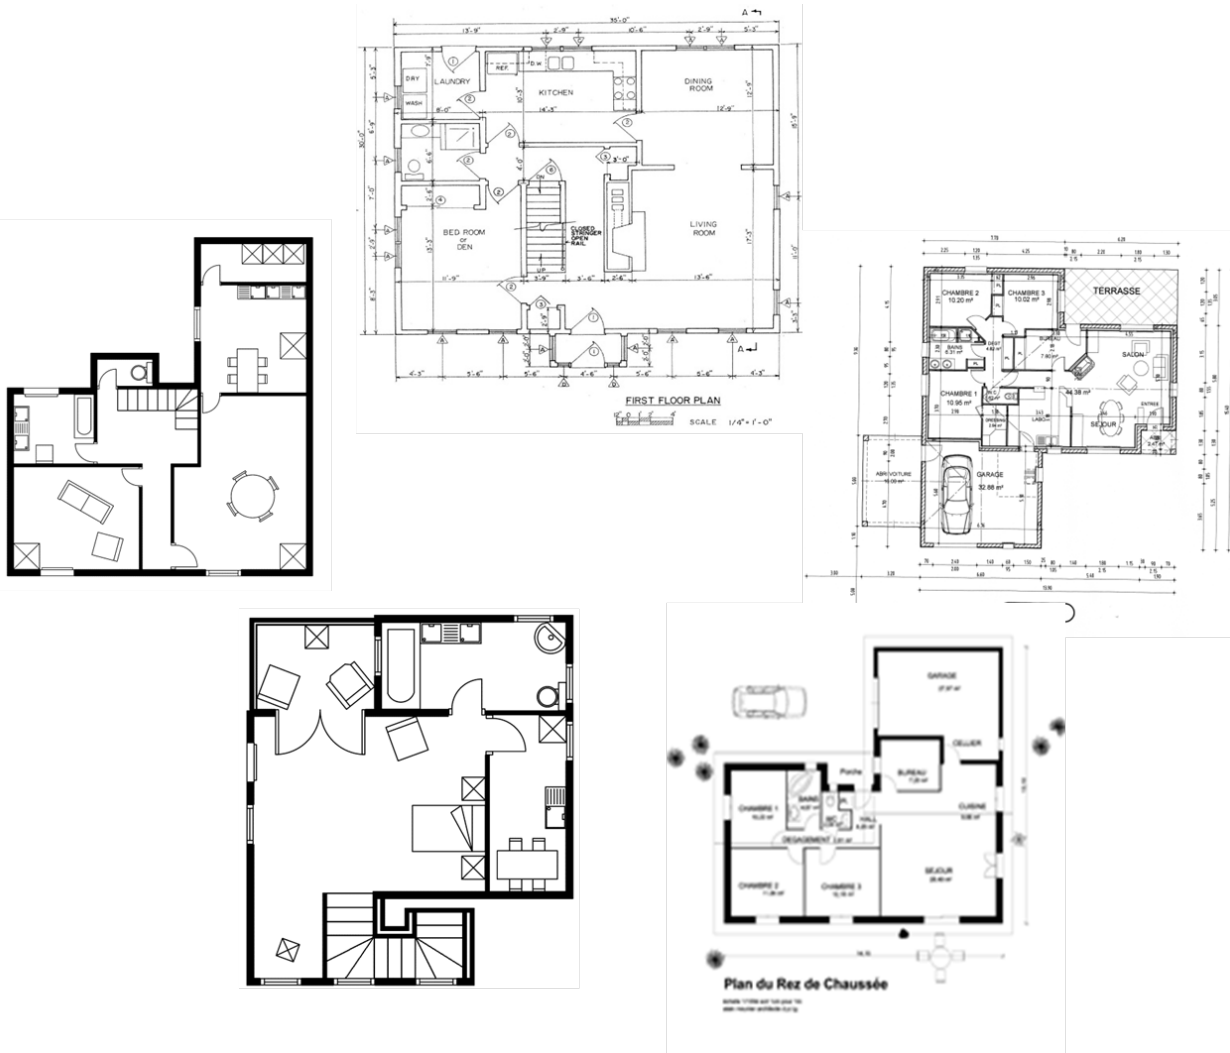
Floor plans, showing 2D cross sections of buildings and displaying heterogeneity in design.
